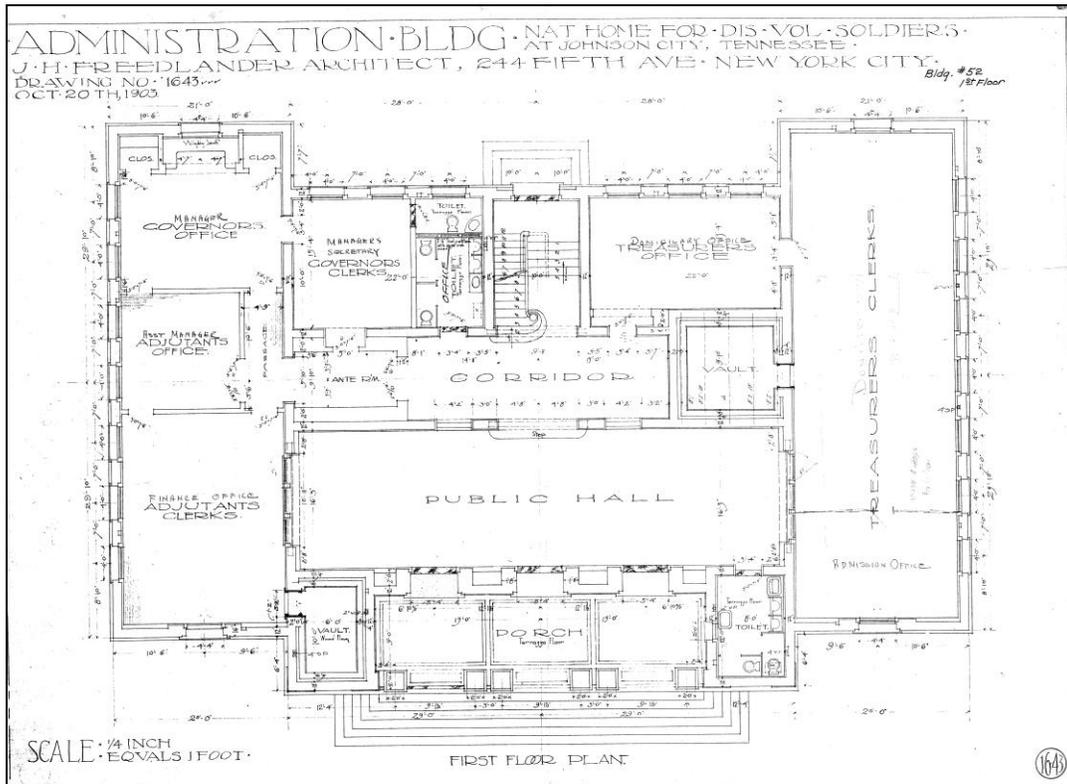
Mountain Branch Administration Building, First Floor Plan, (22 May 1903).
